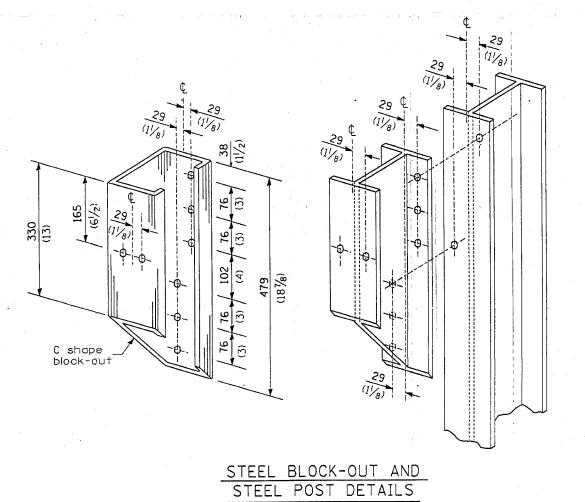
DETAIL OF GUARDRAIL SUPPORT AND END ANCHORAGE
